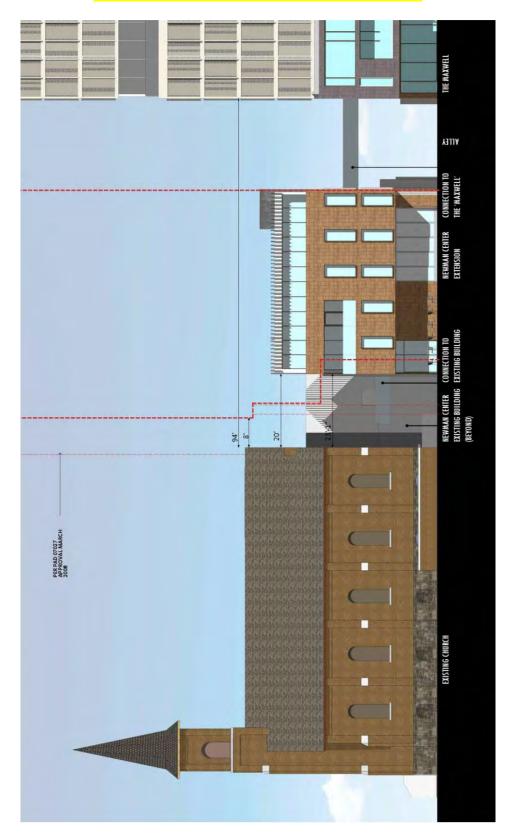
EXHIBIT L COLLEGE AVENUE ENLARGED PARTIAL ELEVATION
